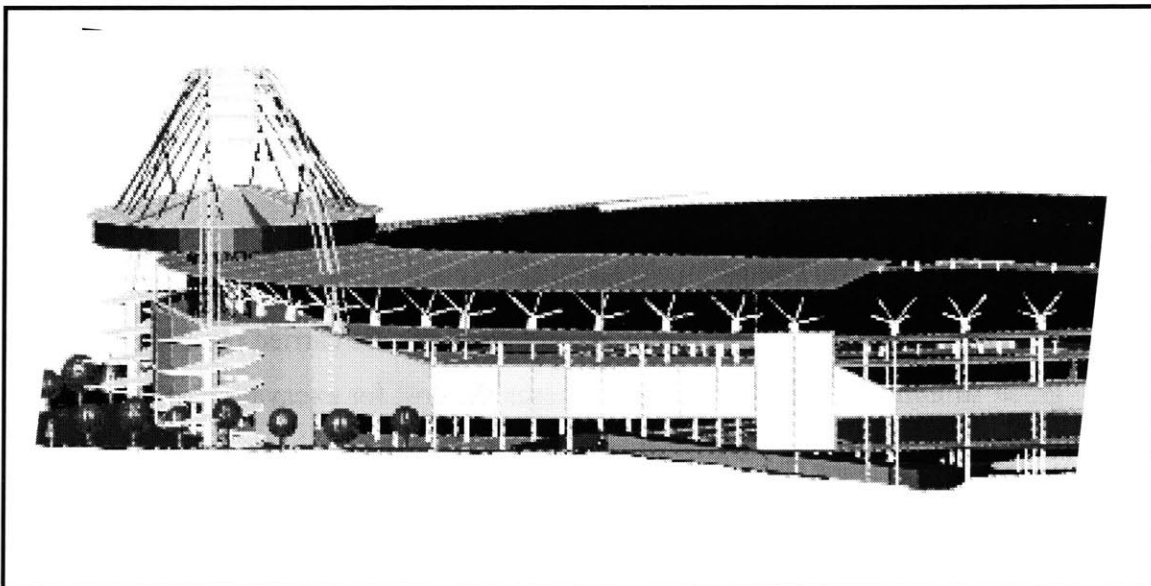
3D elevation of elevated restaurant and the New Red Sox Baseball Stadium from the South.
